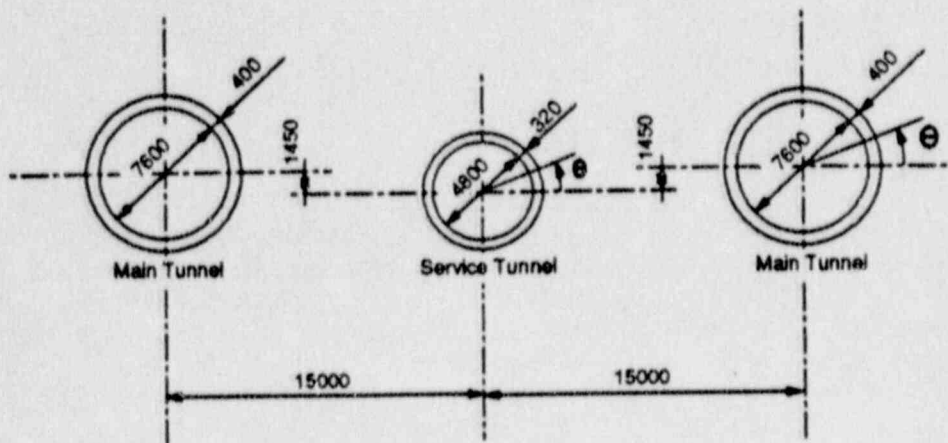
Channel Tunnel Cross-Section (dimensions in mm)
